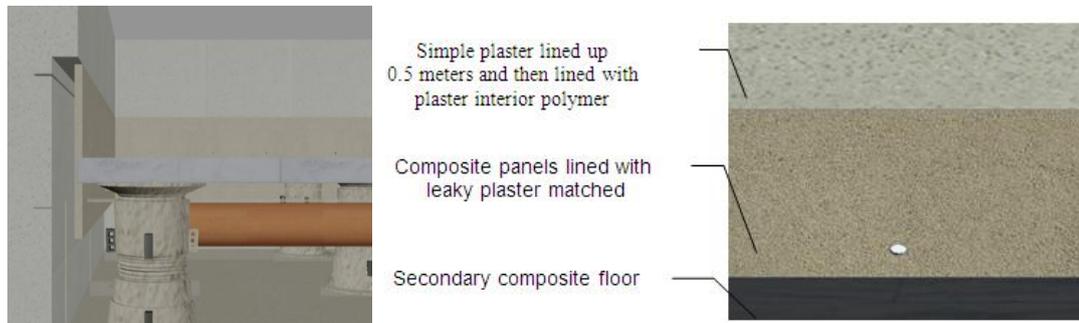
Details coating walls and cover the floor and connecting it to the wall
